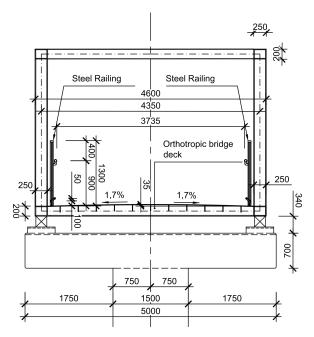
A cross-section of the investigated foot-bridge structure – support [10].
